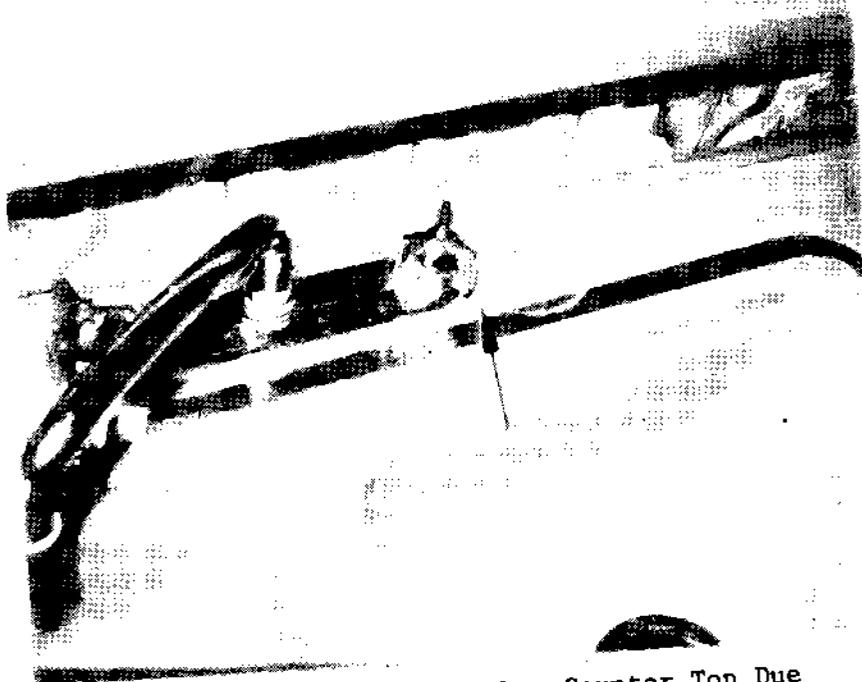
Deterioration of Kitchen Counter Top Due to Water Leak at Faucet
